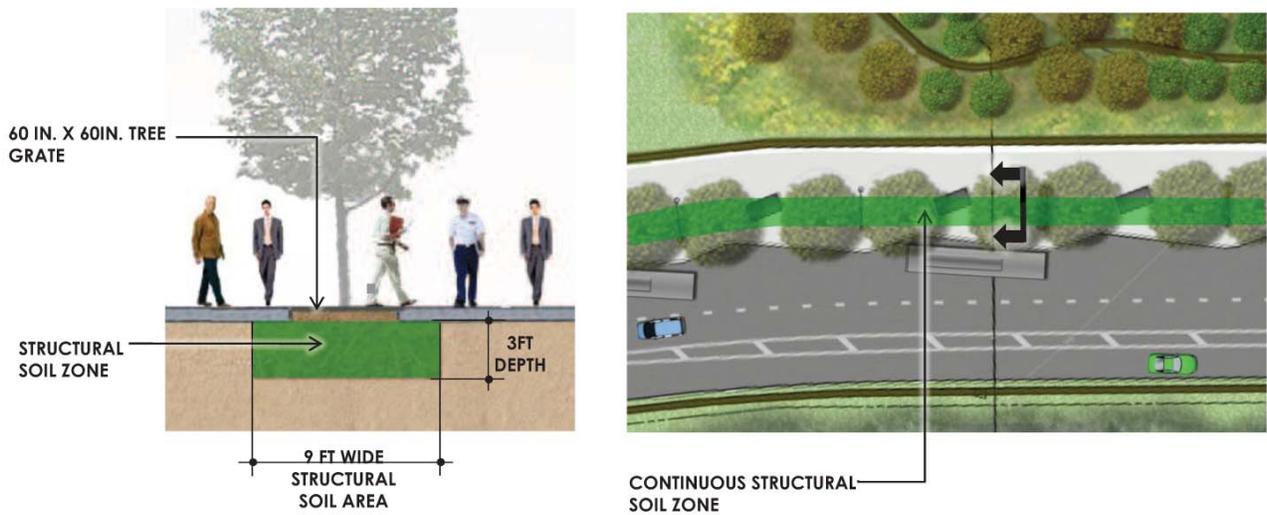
Along the bus bay areas of the access road, the street trees will be planted within tree grates. Soil volumes will be augmented by incorporating CU Structural soil, which allows for proper root growth to occur underneath the sidewalks while providing adequate soil compaction for concrete sidewalks.
